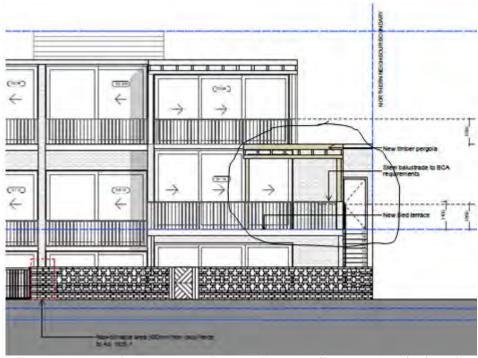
excerpt from proposed Eastern Elevation (Revision B 28/11/2014)
